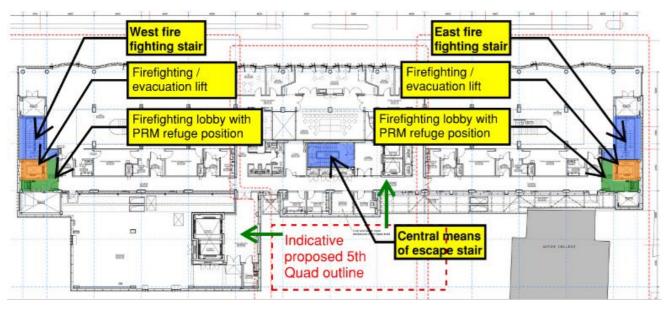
Protected stairs in existing building and indicative location of 5<sup>th</sup> Quad with link bridges
